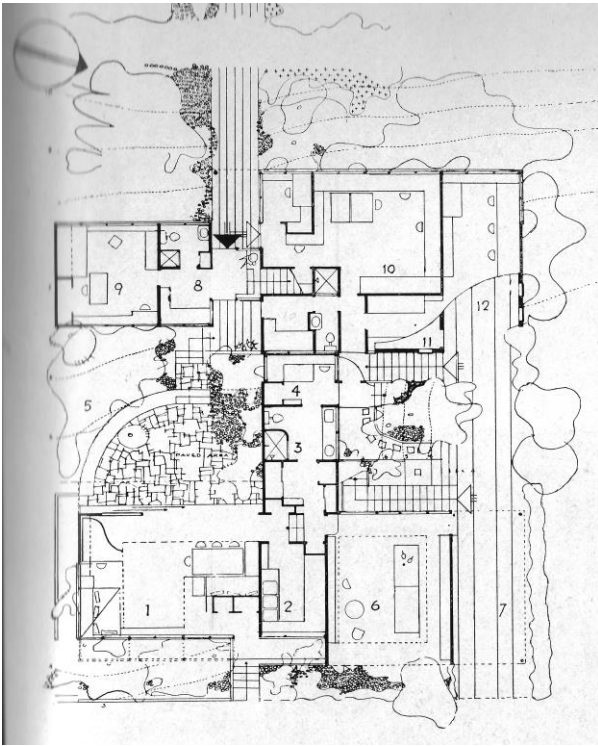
VDL Research House. Ground floor plan. (Boesiger, *Buildings & Projects*, 27.)
